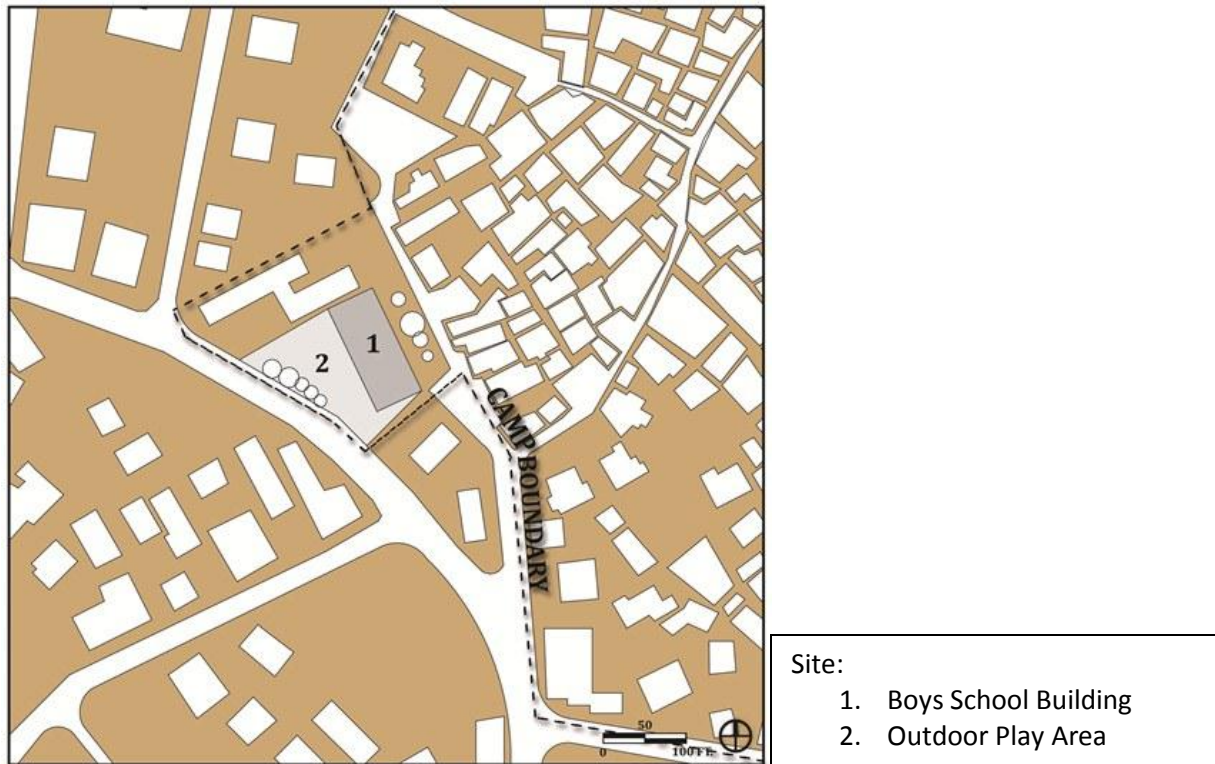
UNRWA School Case Study Site Plan, Source: Jenine Kotob
